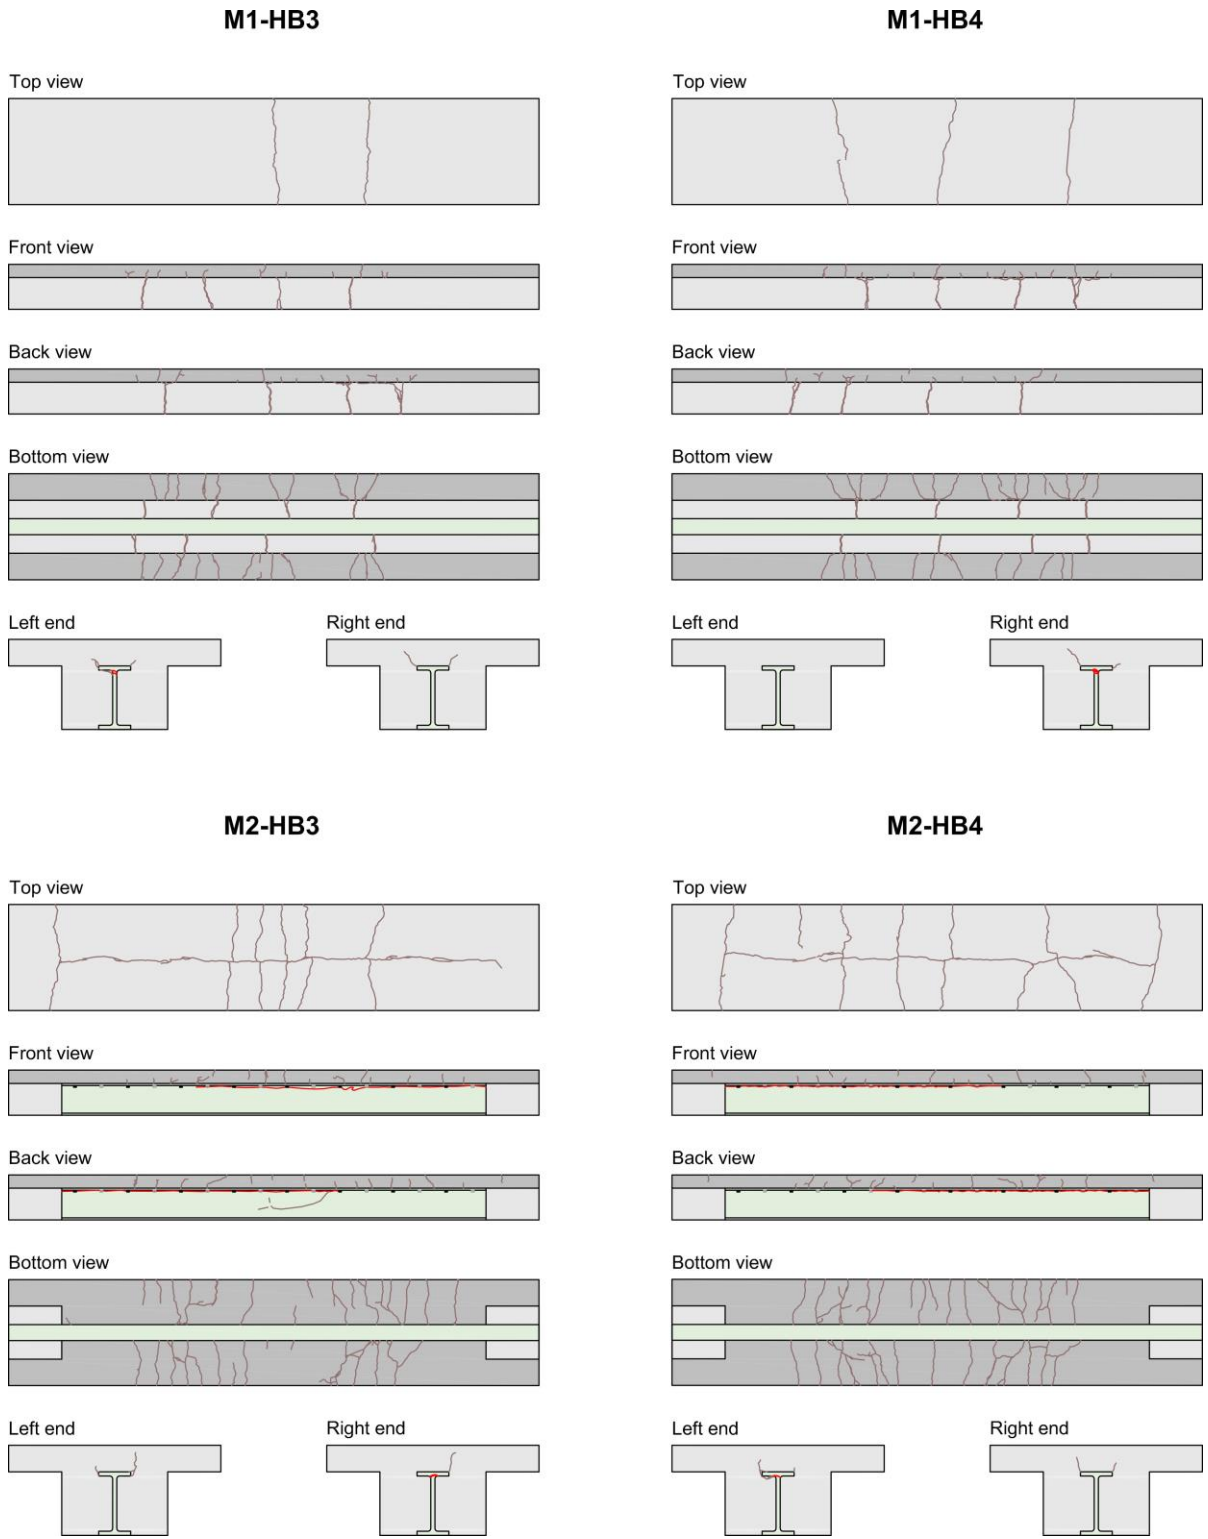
Visible crack patterns of hybrid beams in test setup II. Failure cracks are indicated in bright red.
